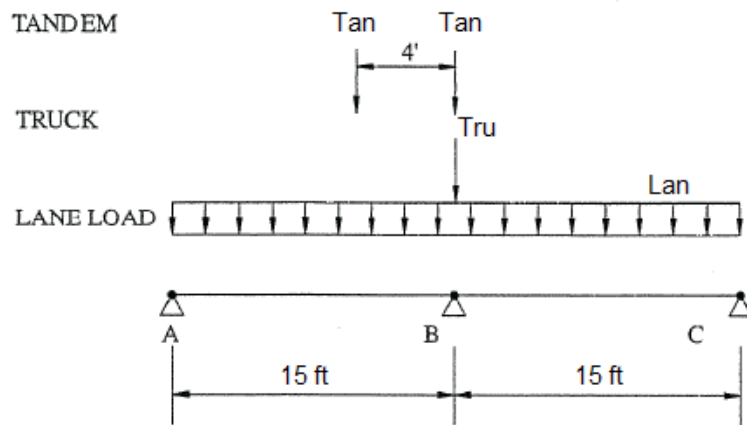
Critical Live Load Position for Reactions on Floor Beam
